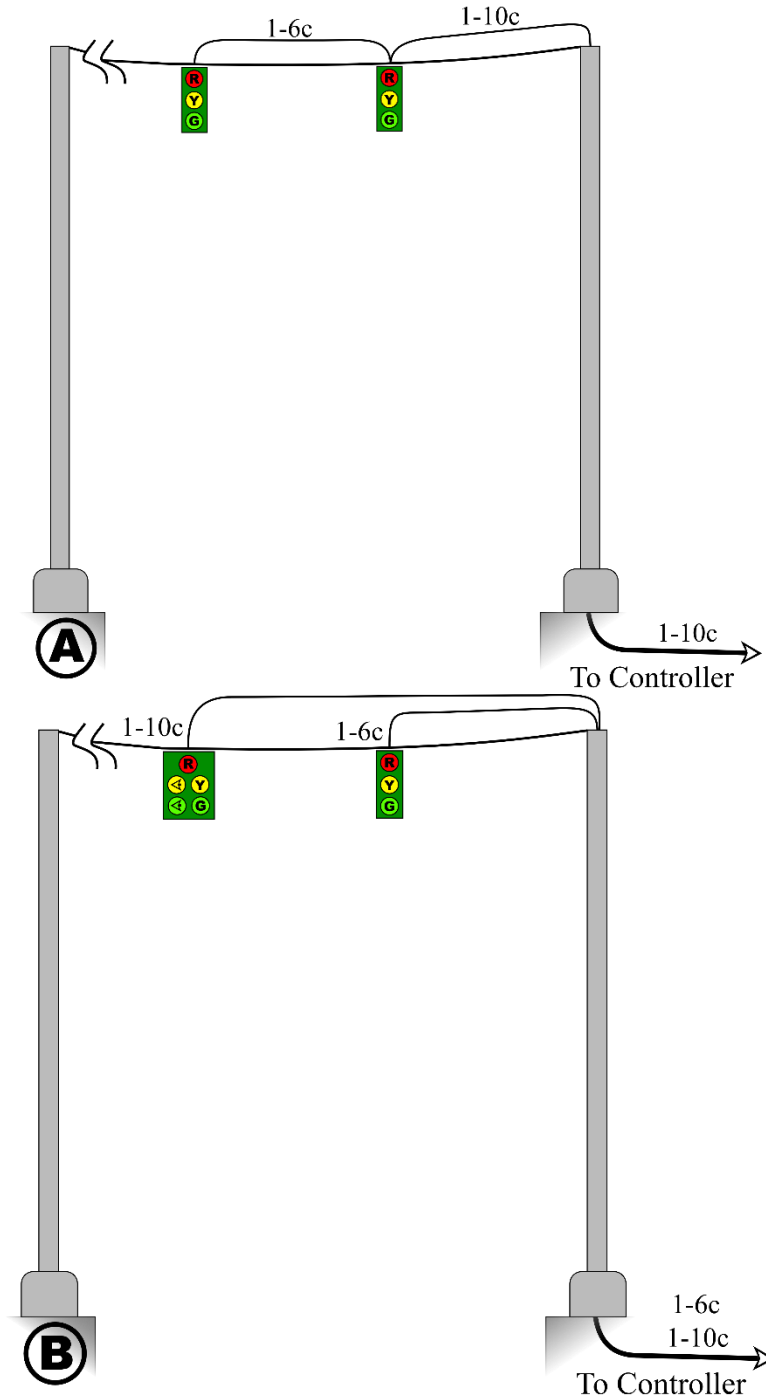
Typical Span Wire Signal Wiring: Examples A & B
